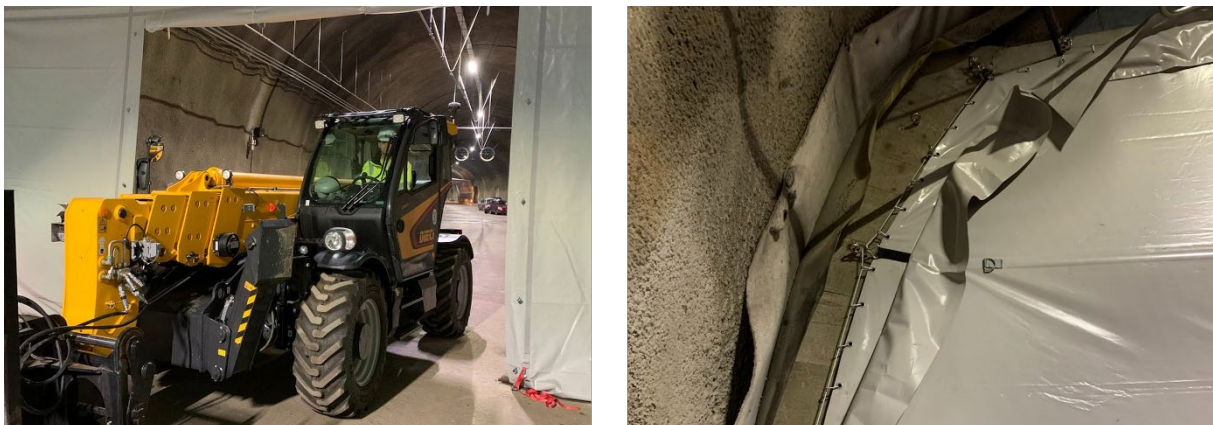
The custom-made mobile ventilation door (left), hooked into the surrounding steel cable with carabiners (right), in operation. The door cover is rolled up and fixed for passage, vertical and horizontal reinforcement straps, ground anchoring and the surrounding flap, which self-compacts under pressure are clearly visible (Photos: Hofer).
